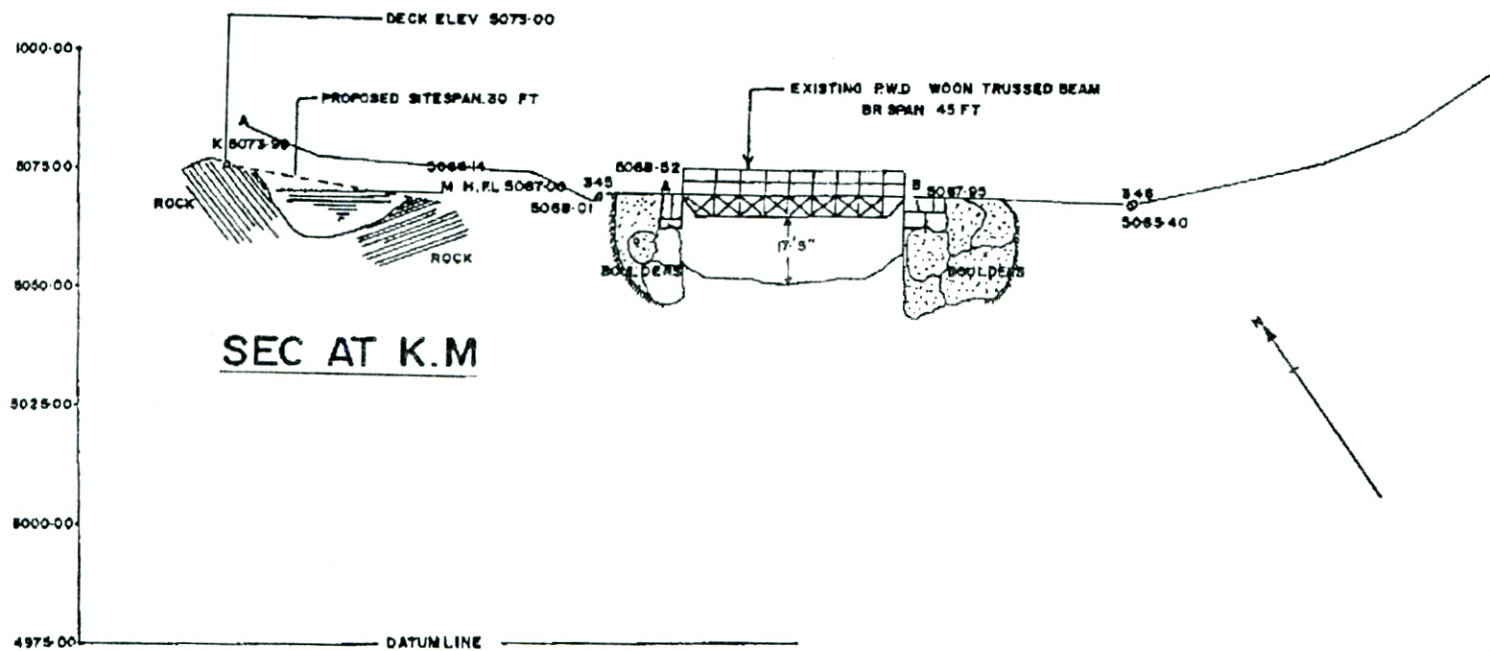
Geologic cross section at the proposed Staghchu Nullah bridge.
